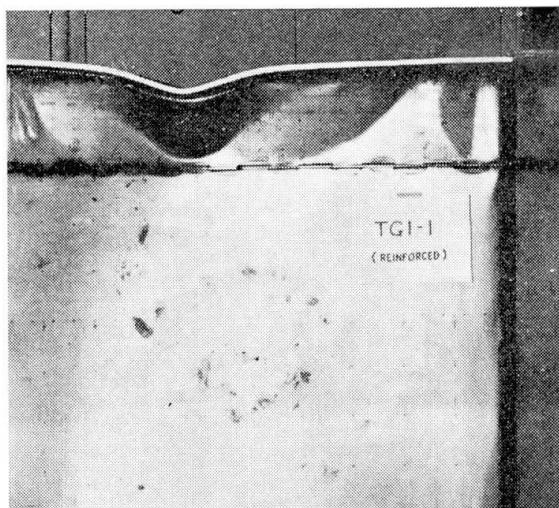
View of front side of central panel of girder TG 1-1 after test to failure.
